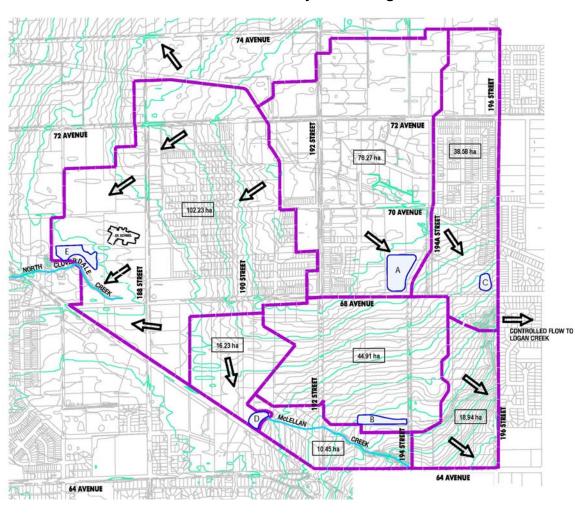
Final Amended East Clayton Drainage Plan
